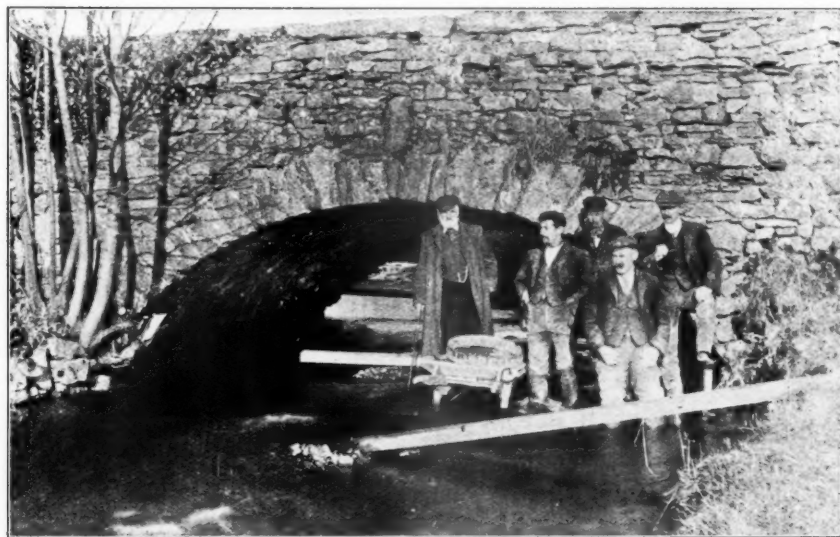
AN OLD BRIDGE IN WESTMORLAND, REPAIRED BY GROUTING MACHINE
